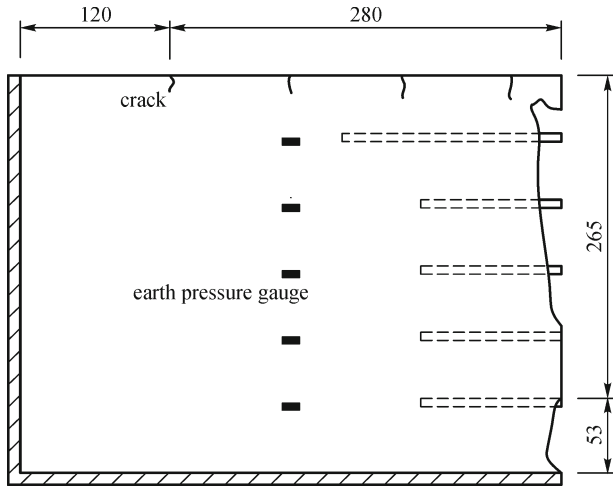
Final failure shape of A-A cross-section with bolt reinforcement in case 6 (unit: mm)
